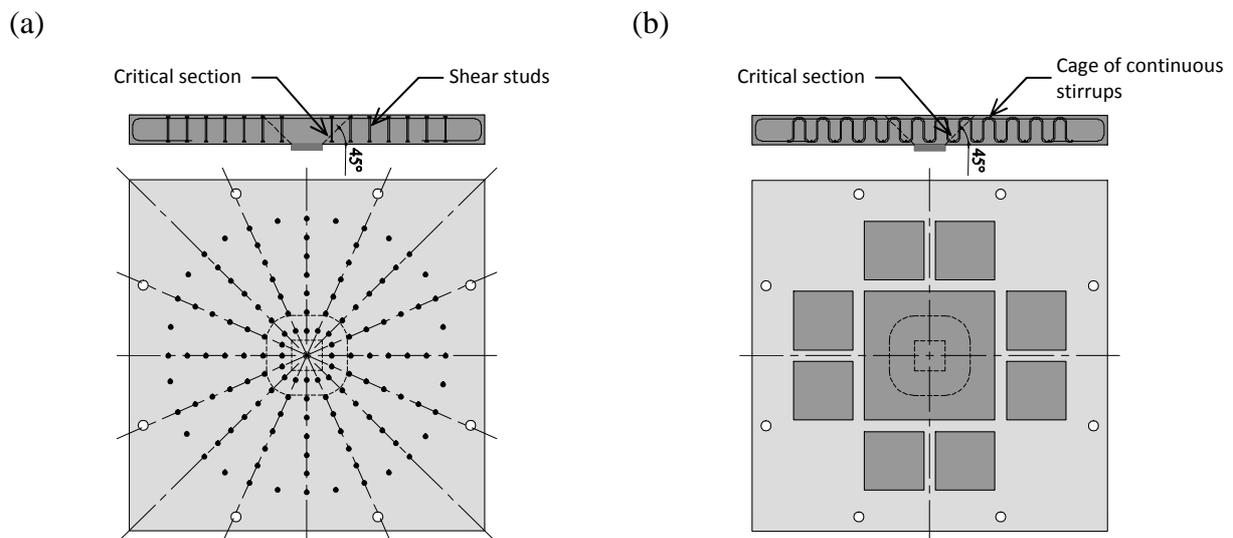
Definition of the critical section and shear reinforcement layouts: (a) shear studs and (b) cage of continuous stirrups
